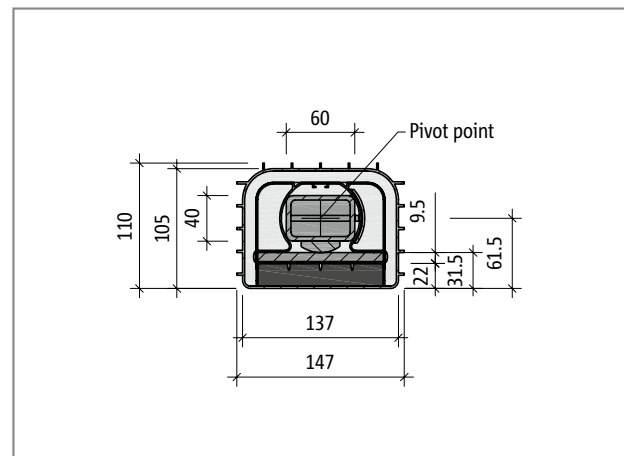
Schöck Tronsole® type Q: Product cross-section B-B with horizontal load-bearing element
